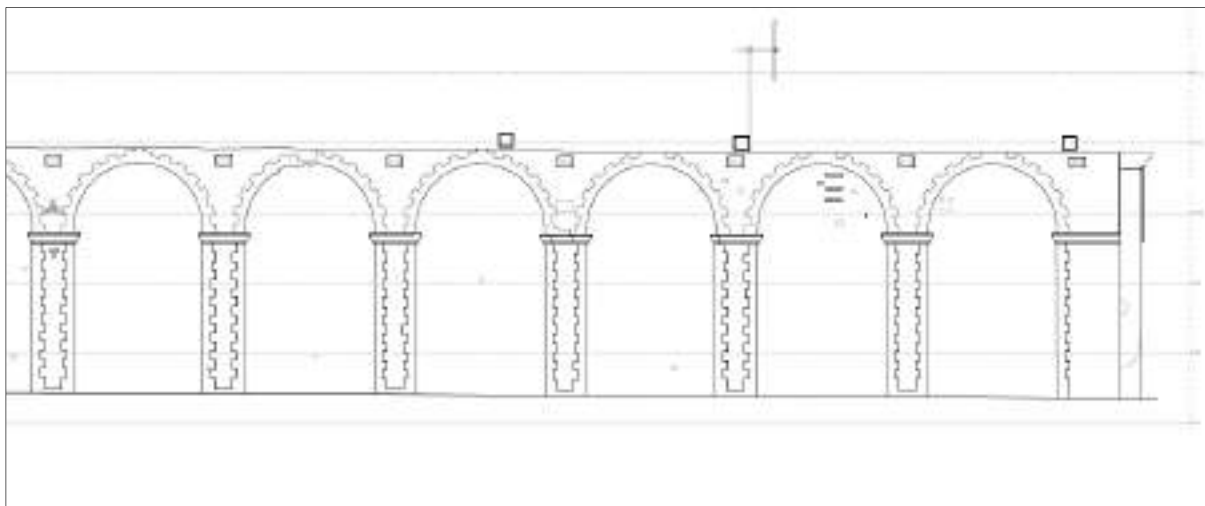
Architectural rendering of front elevation of redbrick wall/arcade (extract from Murphy Surveys drawing package)
